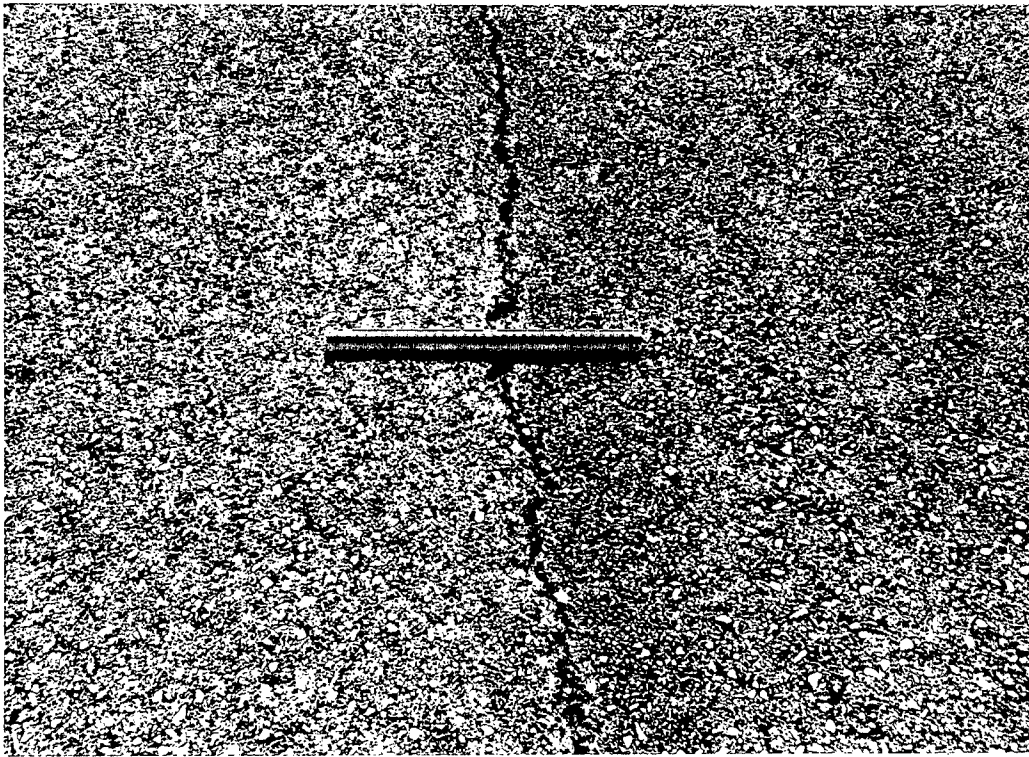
Typical longitudinal cracking, Runway 15-33 (R3C)
